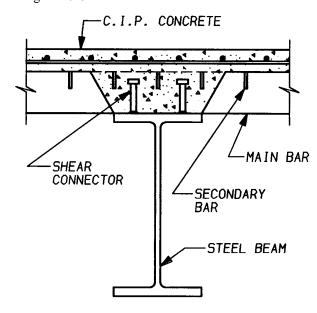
An Acceptable Shear Connection of Unfilled Grid Decks Composite with Reinforced Concrete Slabs to Beams
